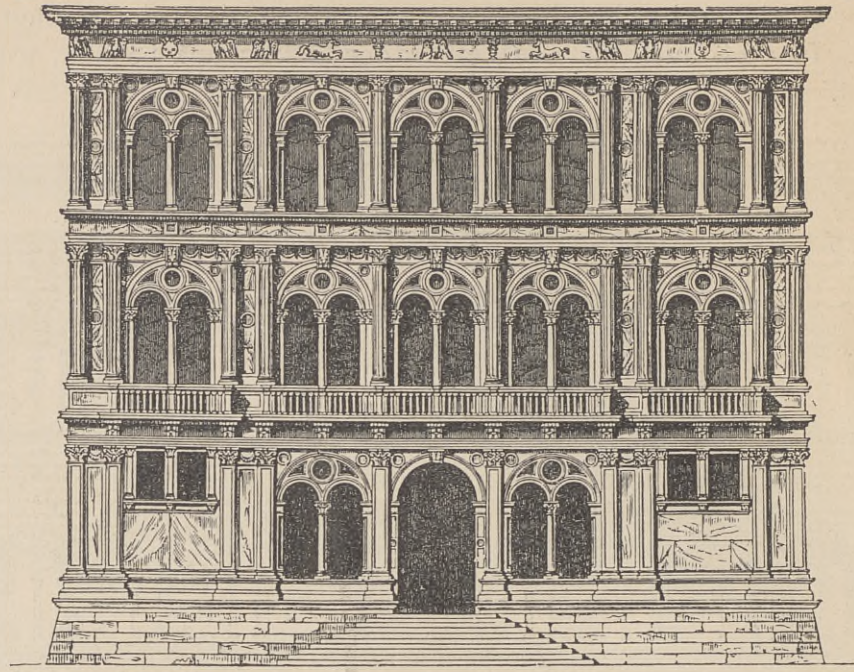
Palazzo Vendramin. 1481. Pietro Lombardi.
